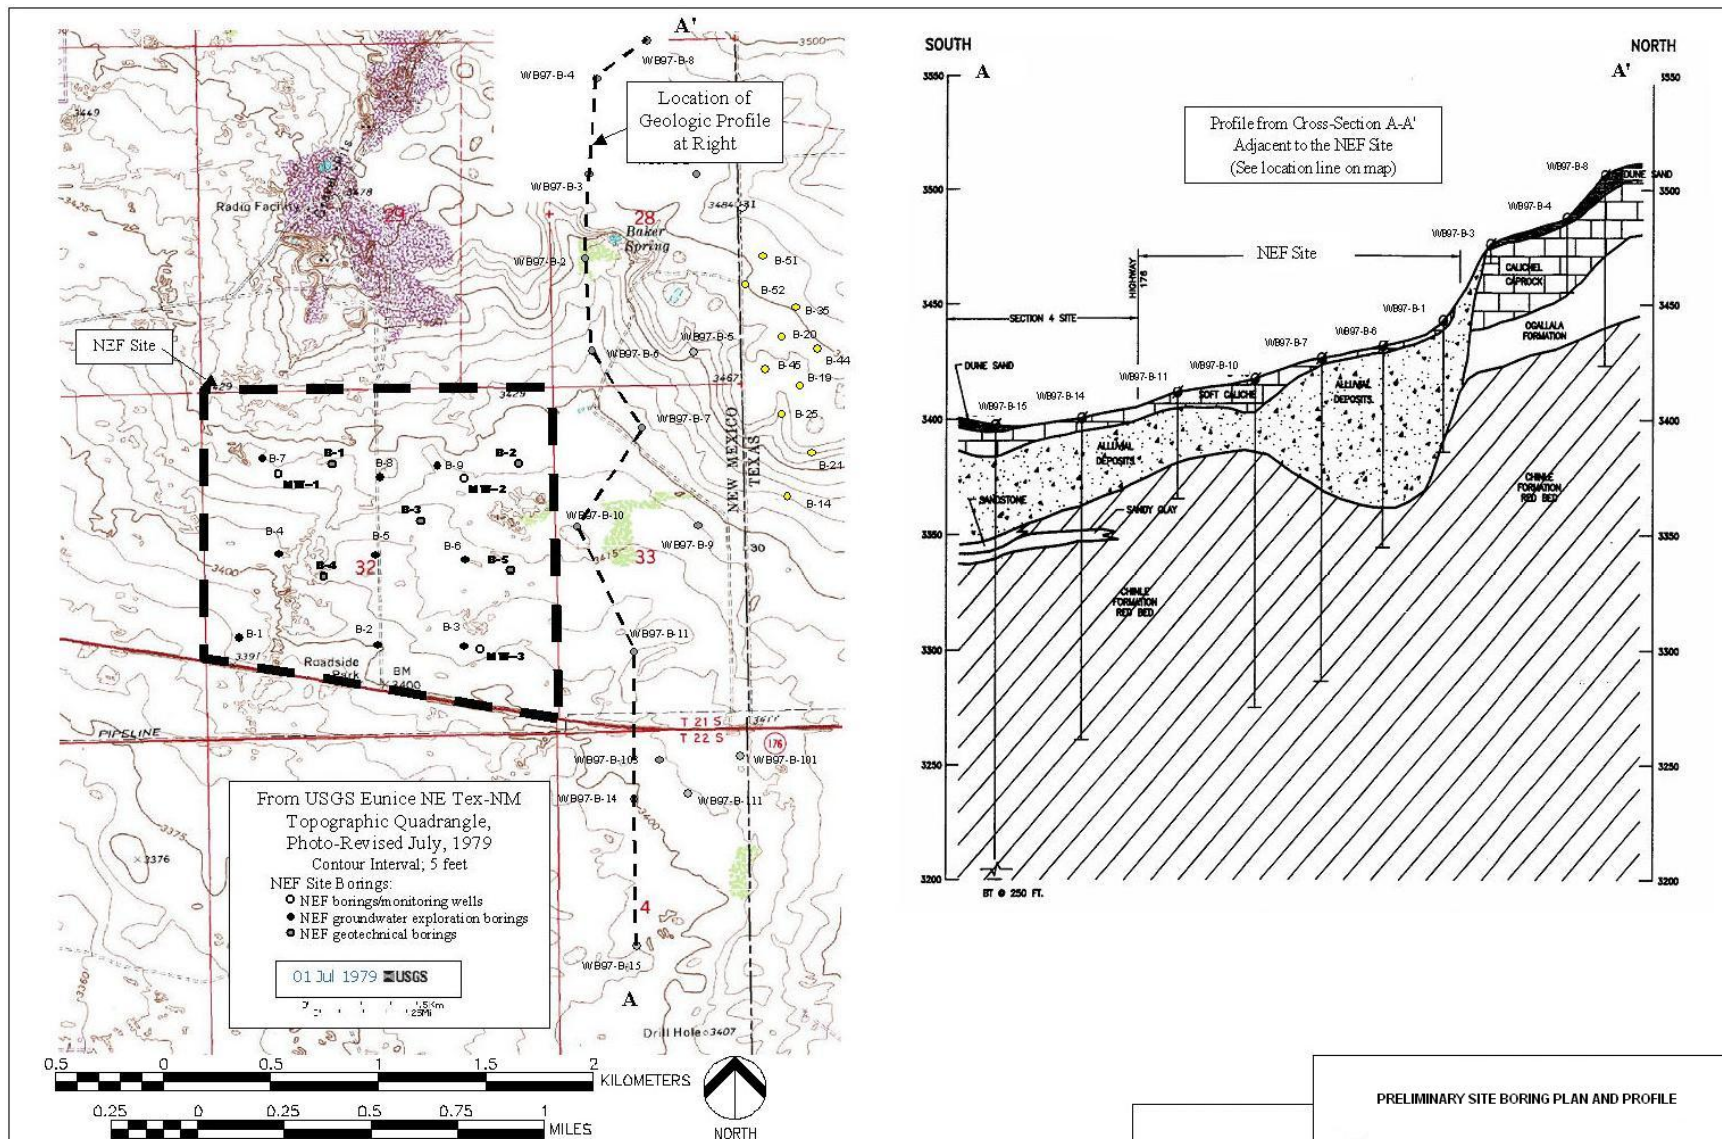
Preliminary Site Boring Plan and Profile
